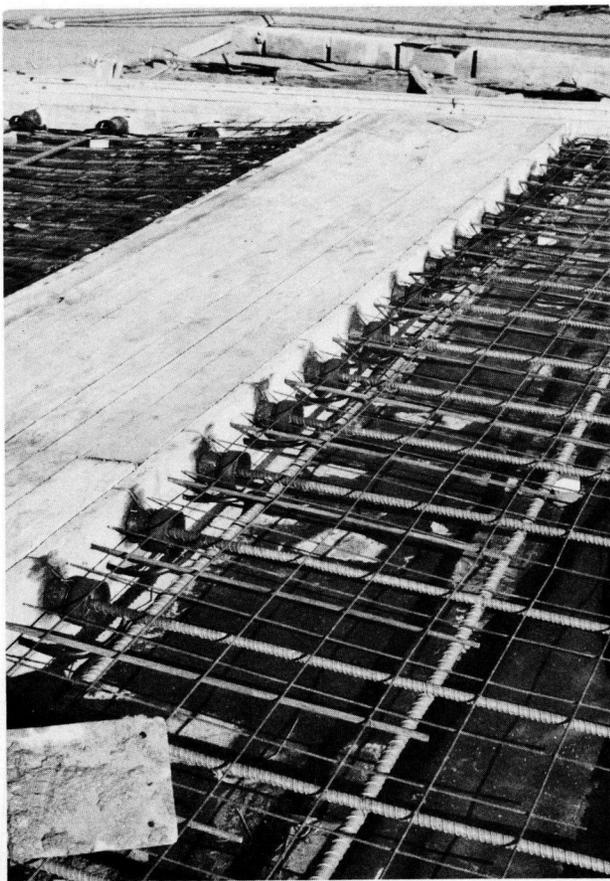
Details of slab end reinforcing and conduit placement for post-tensioning tendons in runway slab under construction at new Wahn Airport serving Cologne and Bonn.
